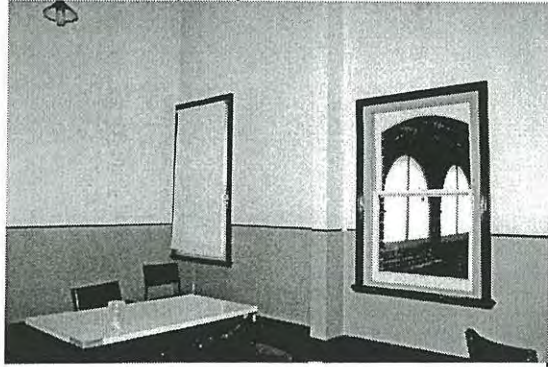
Interior, Office (spaces FF01-02). View of north-east corner showing projecting wall nib (indicating previous original wall) and the timber framed double hung windows.
